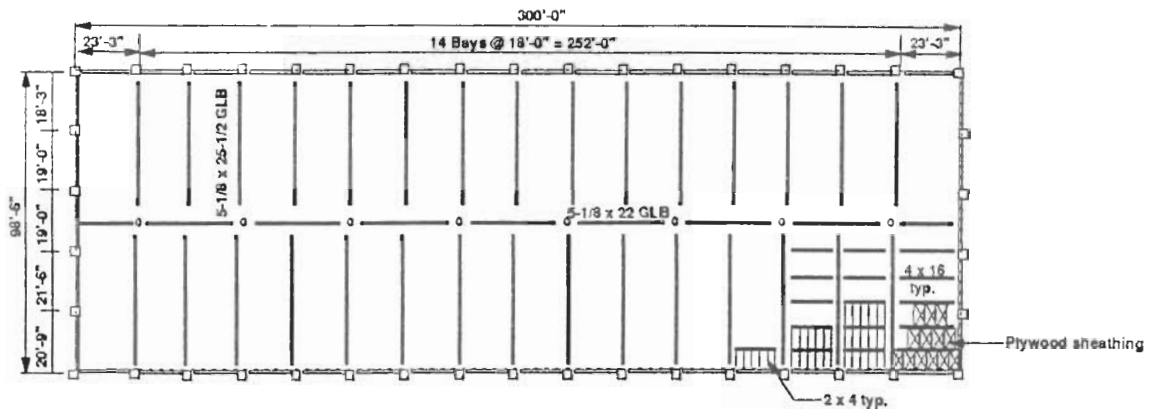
Hollister Warehouse, Roof Plan and Instrument Layout
